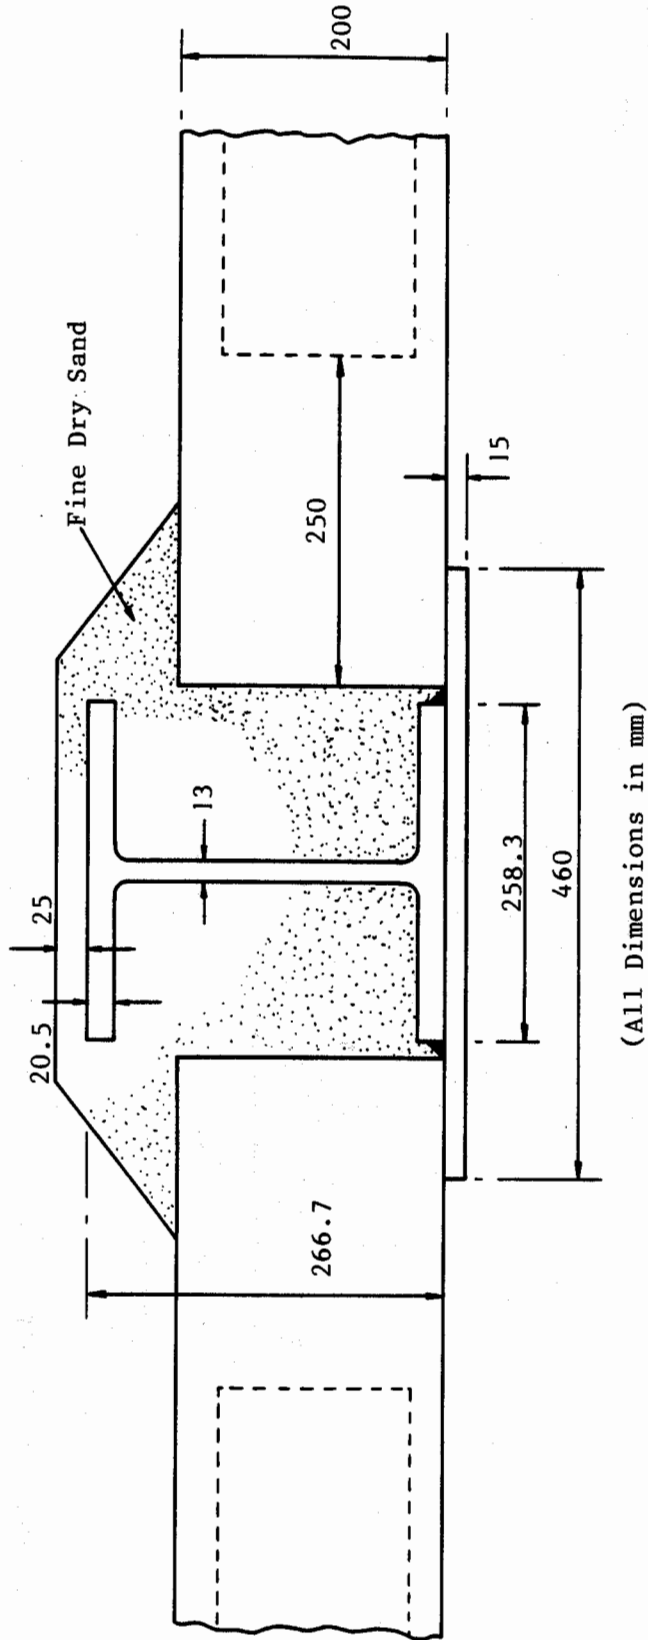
SCHEMATIC ARRANGEMENT OF COMPONENTS - TEST NO. WFRS 50521 (TRANSVERSE SECTION) (R4/23)
